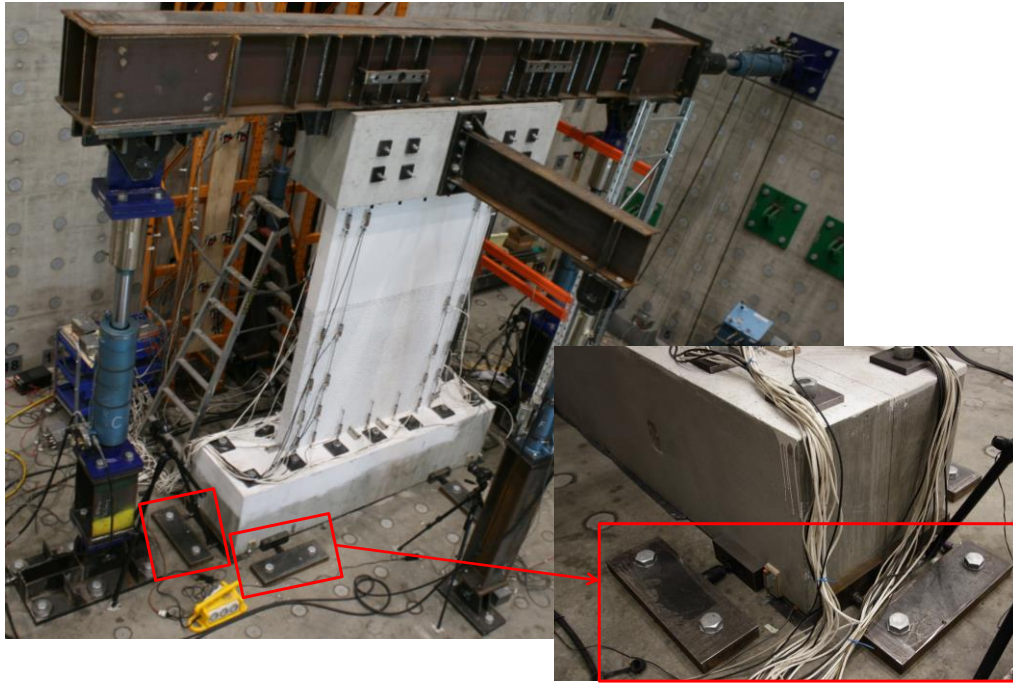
Jacking bolts used to limit the movement of the foundation
